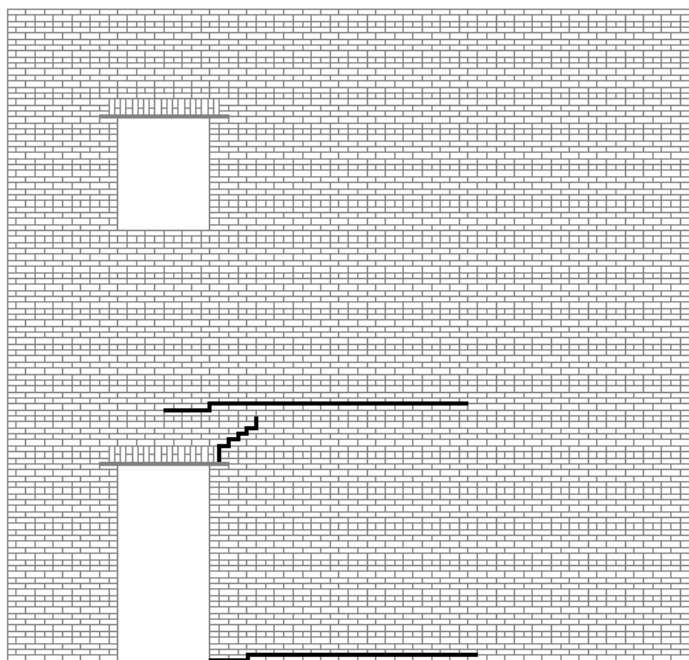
Crack locations in wall 1 after 20%-XY seismic test.
